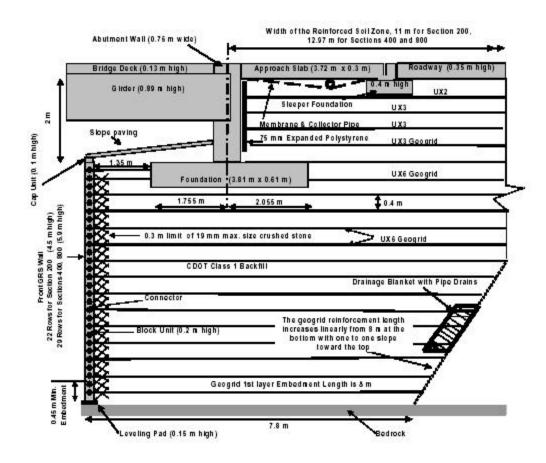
Typical Cross Section through the Front and Abutment GRS Walls, Abu Hejleh, et al., (2003).
